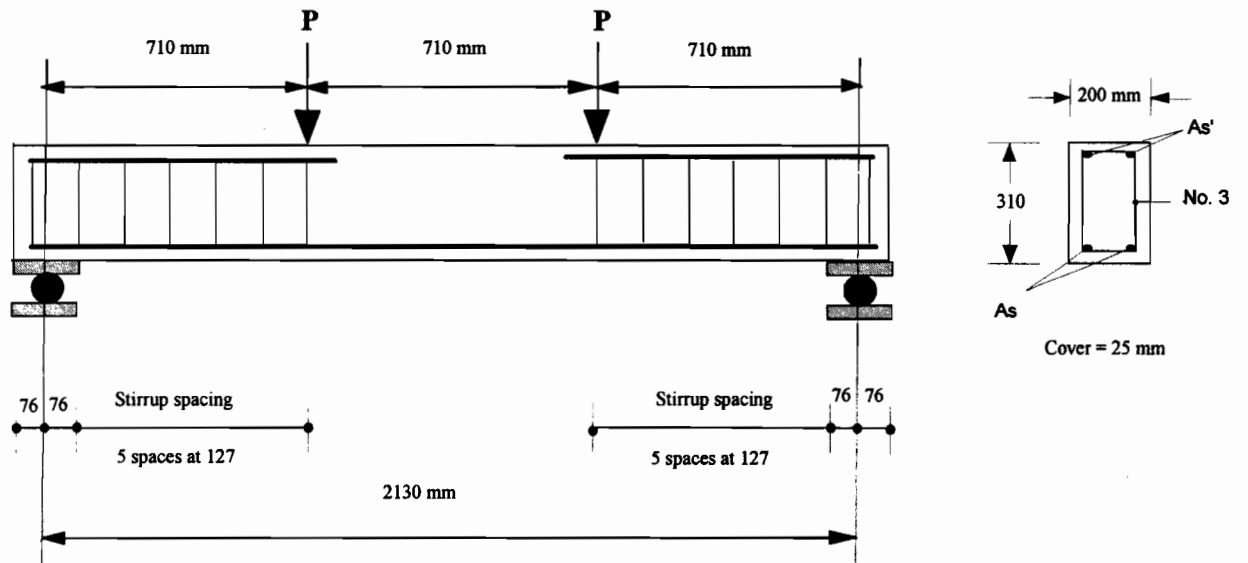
Geometry and reinforcement details of beams tested by Leslie et al. (1976).
